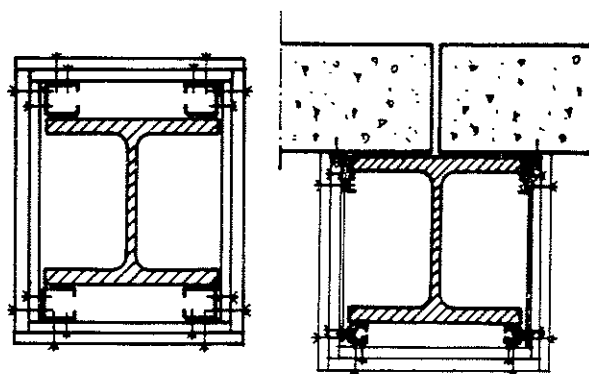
b. Sketch showing fire insulation of columns and floor girders with two layers of 13 mm gypsum plaster slabs. On the girder, the sections of metal sheeting are suspended on steel straps attached to special sections fixed in the precast floor units
